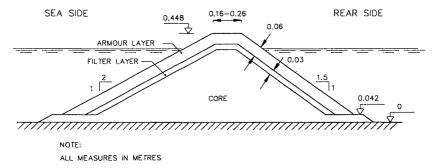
Typical cross-section of breakwater used in the overtopping tests.
